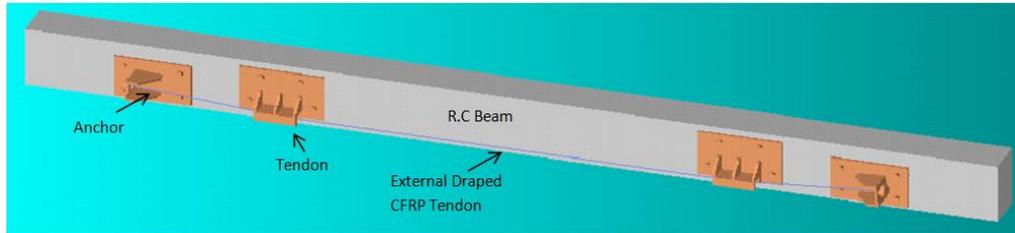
a Beam Test With Anchor Ansys Model Setup
